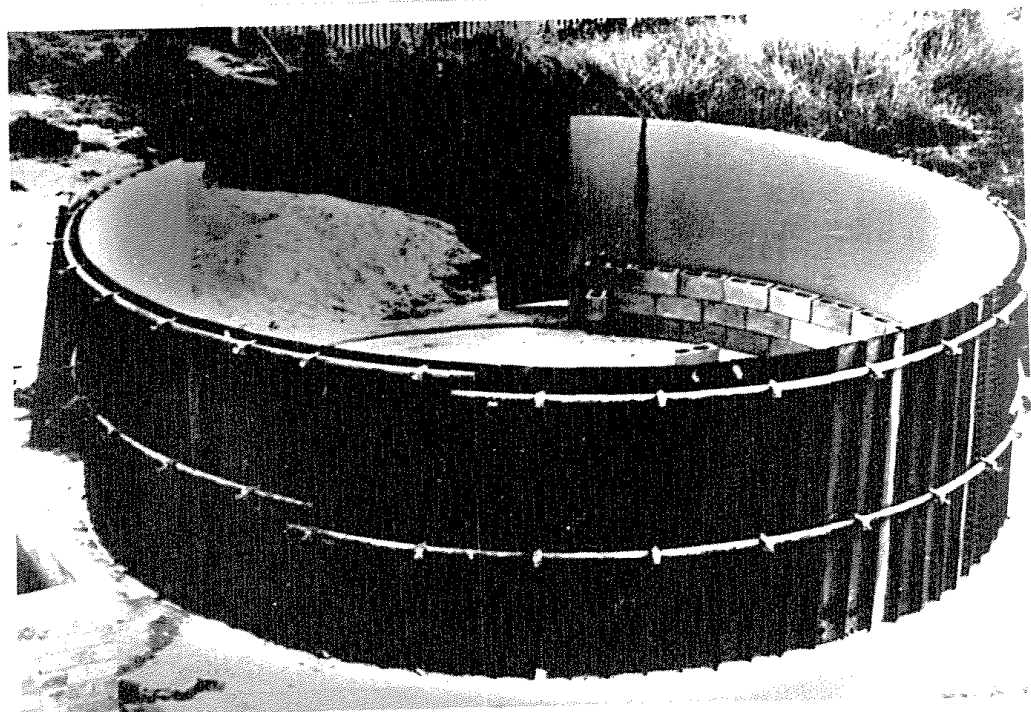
CIRCULAR TANK WITH ACCESS PANELS REMOVED
